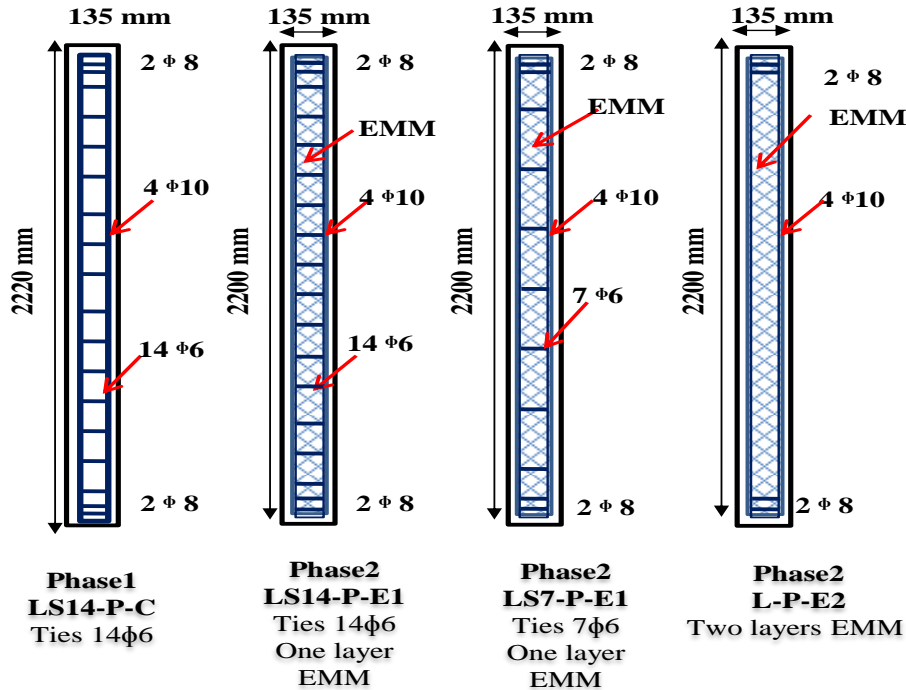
Dimensions and Reinforcement Details of Tested Column Specimens
